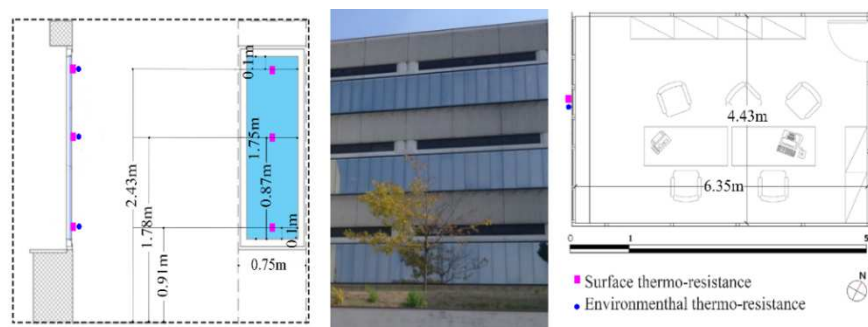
Plan of the monitored room: a vertical section with monitoring positions, view of the facade from the external side and plan of the internal room.
